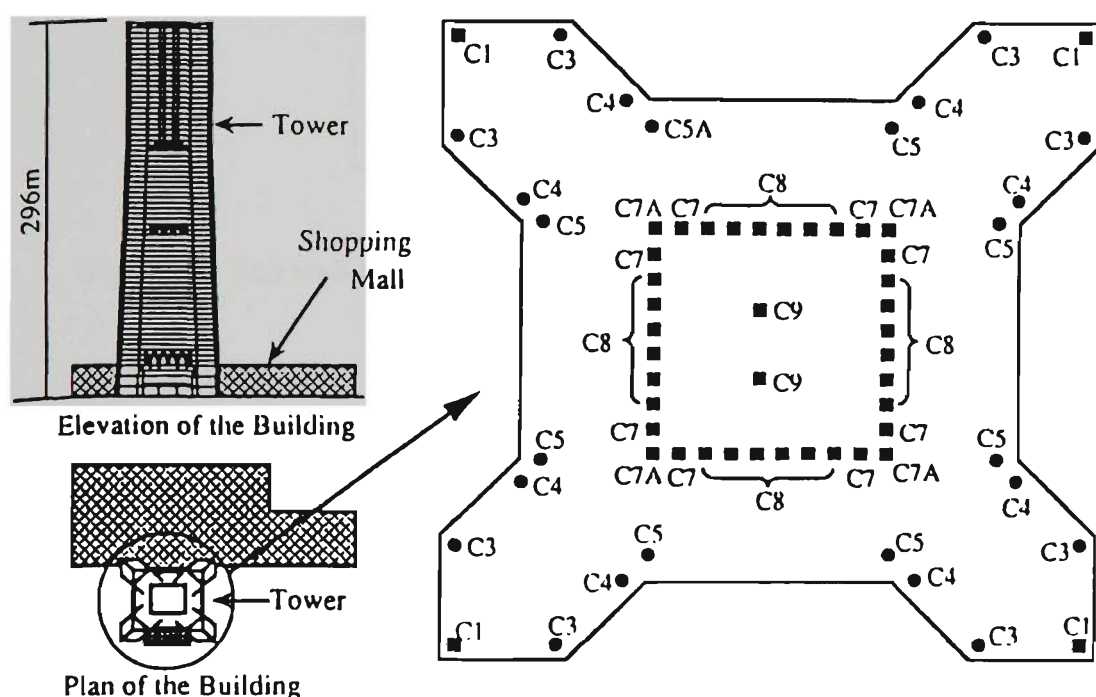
The Landmark Tower (296-m high), Yokohama and floor plan showing locations of the 66 filled steel tubular columns (after Hayakawa et al, 1995)
